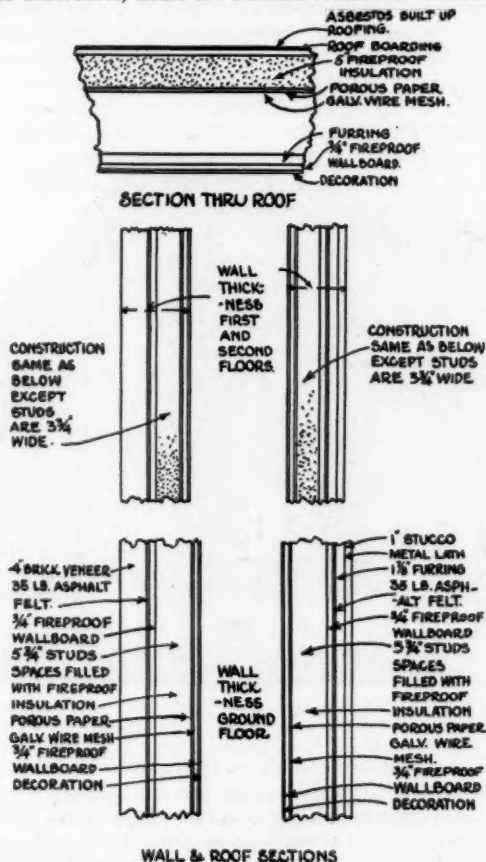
A.—DETAILS OF WALL AND ROOF SECTIONS
